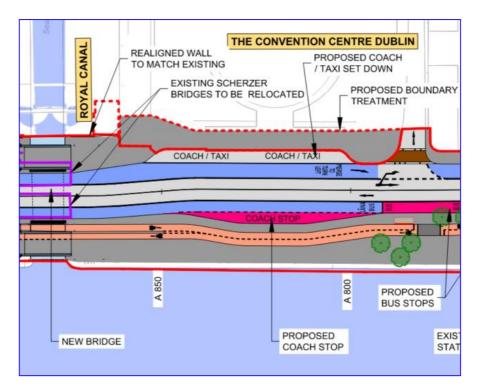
Proposed Road Layout in Section 1.1C at the Convention Centre
